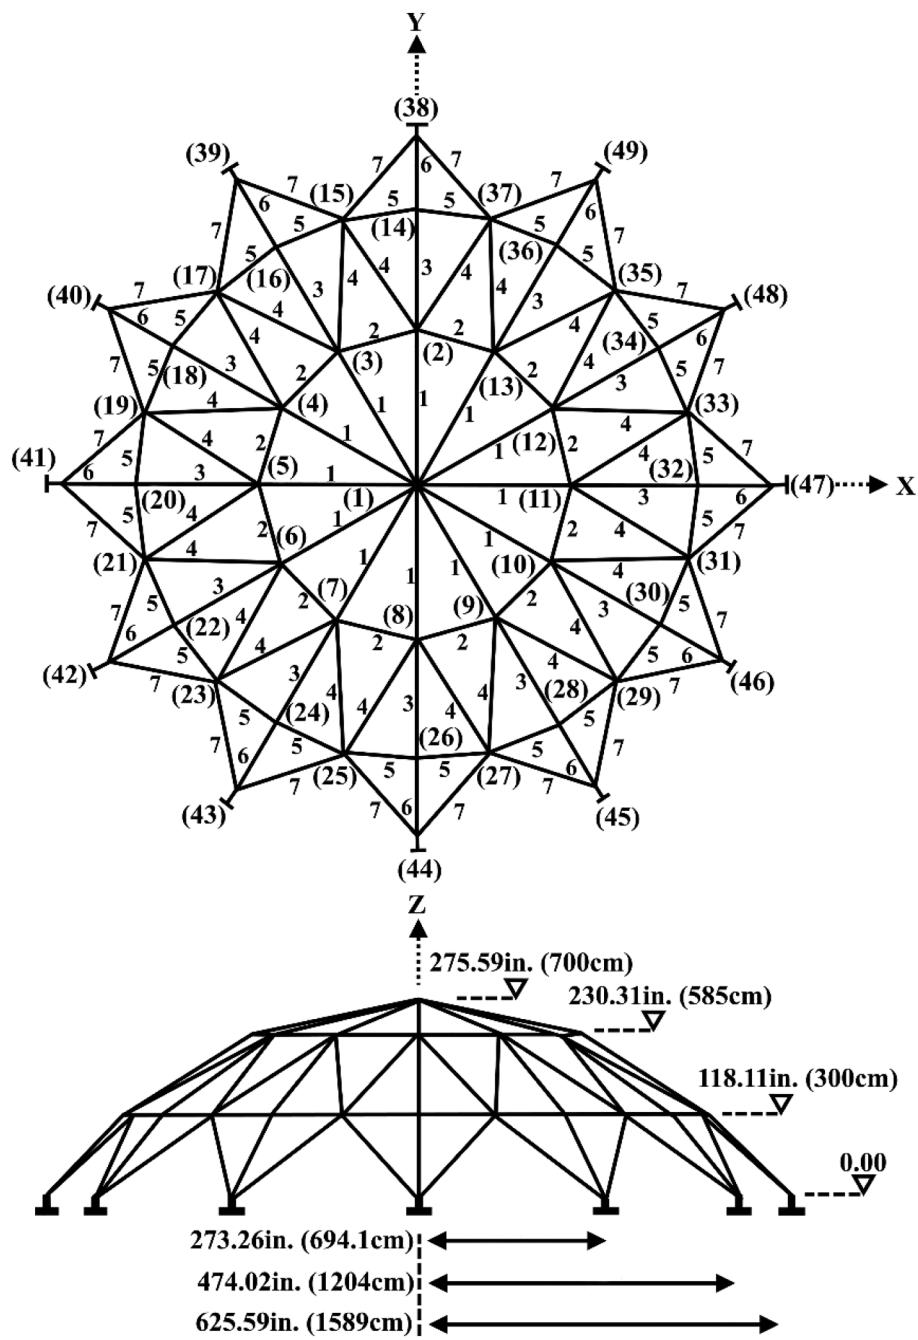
Schematic of the spatial 120-bar dome-shaped truss structure.
